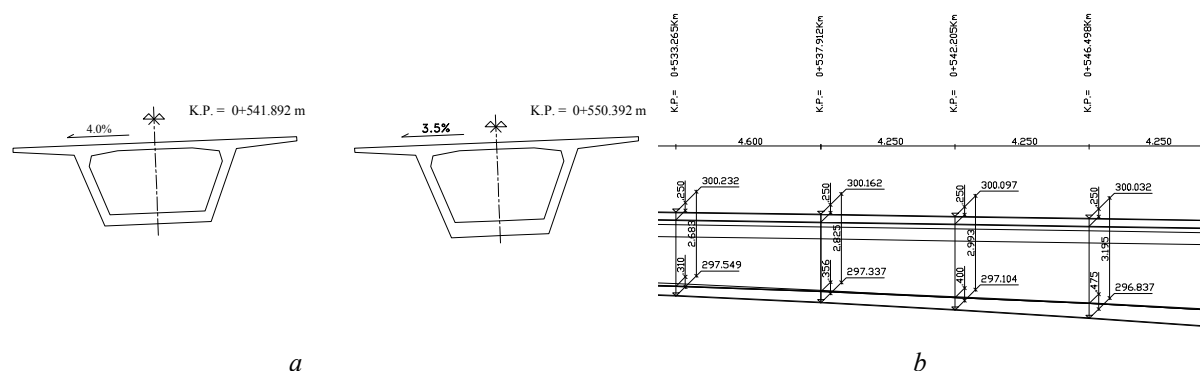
Representation of cross-sections and detail of a longitudinal section of a deck.
